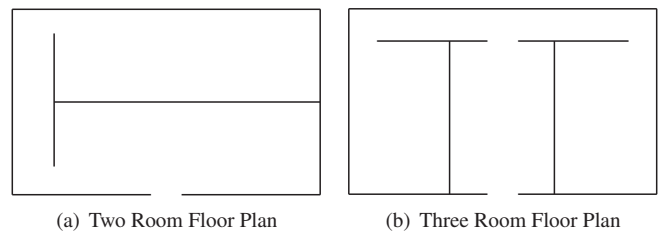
Conceptual diagrams of the buildings used in Experiment 2. For each floor plan, three buildings were generated with the adjacent rooms overlapping by 25%, 50%, and 75%.
